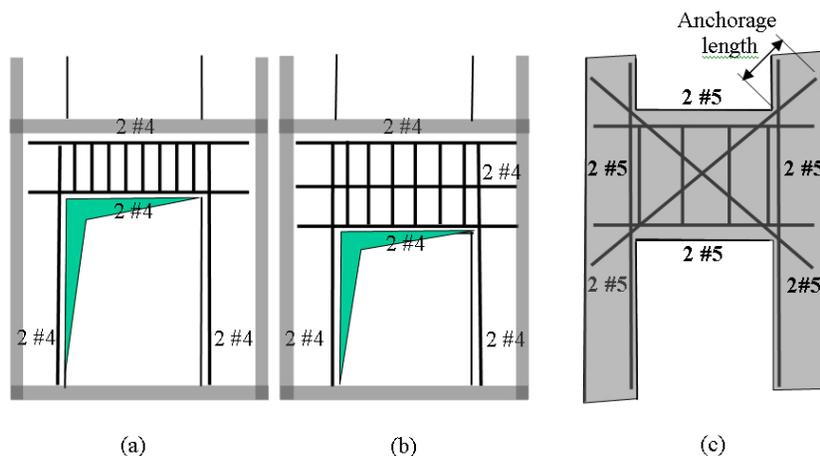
Reinforcement detailing around the openings of pierced shear-walls
